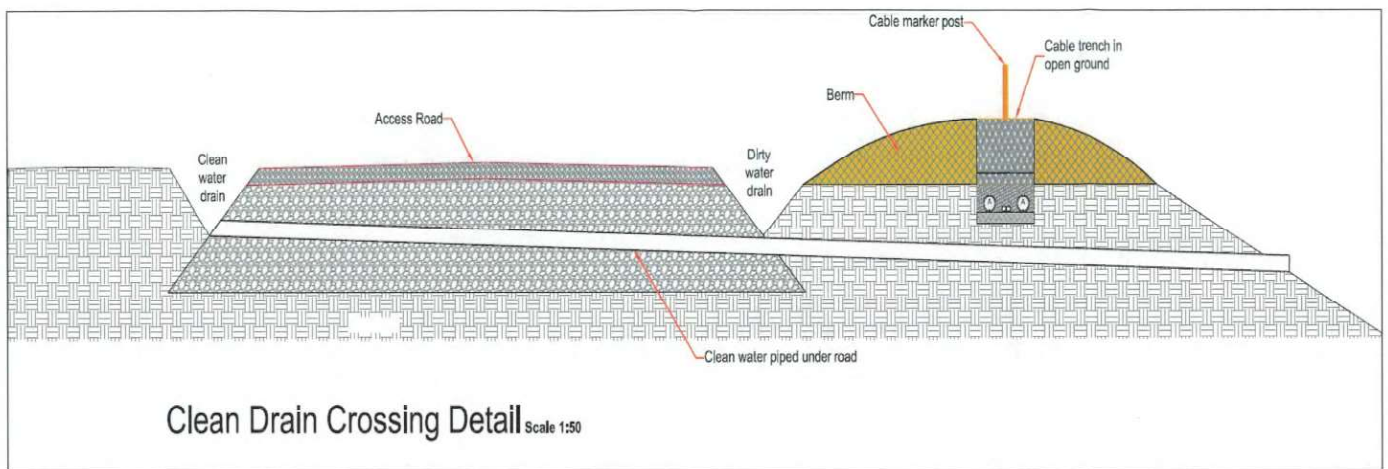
Proposed Road and Trench Sections and Drain Crossing Details.
